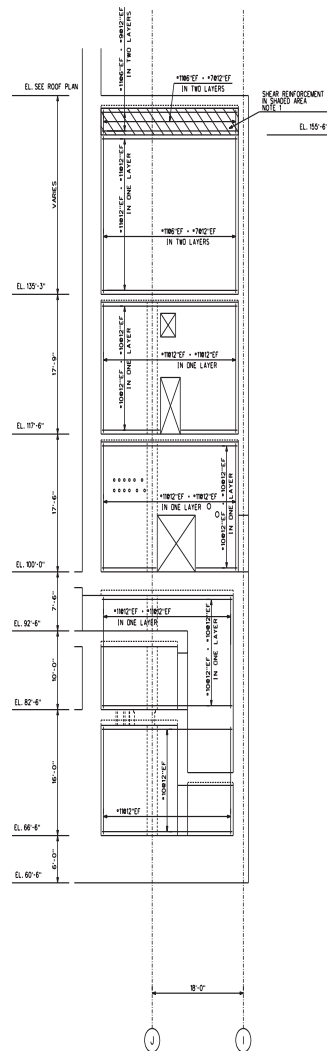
H.5-3 [Typical Reinforcement in Wall on Column Line 1]
